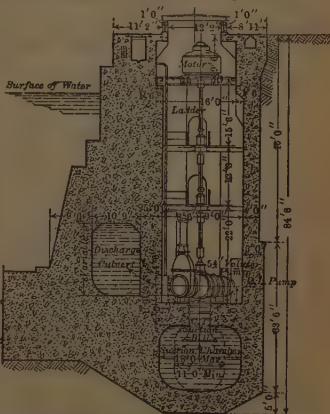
Cross-section of Pumping Plant, Phila., Pa., and Norfolk, Va.
